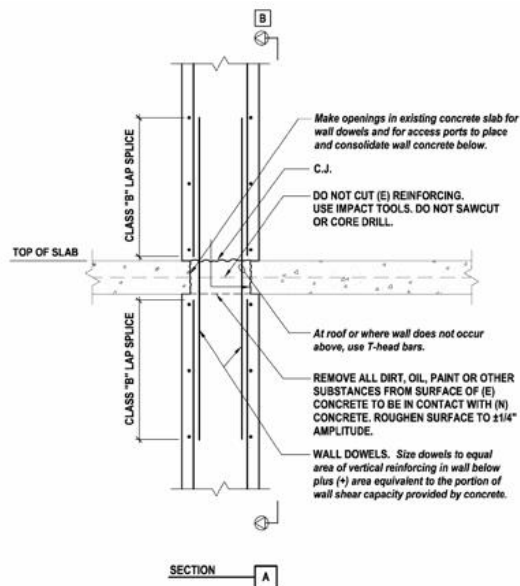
A: Concrete Wall Connection to Concrete Slab
